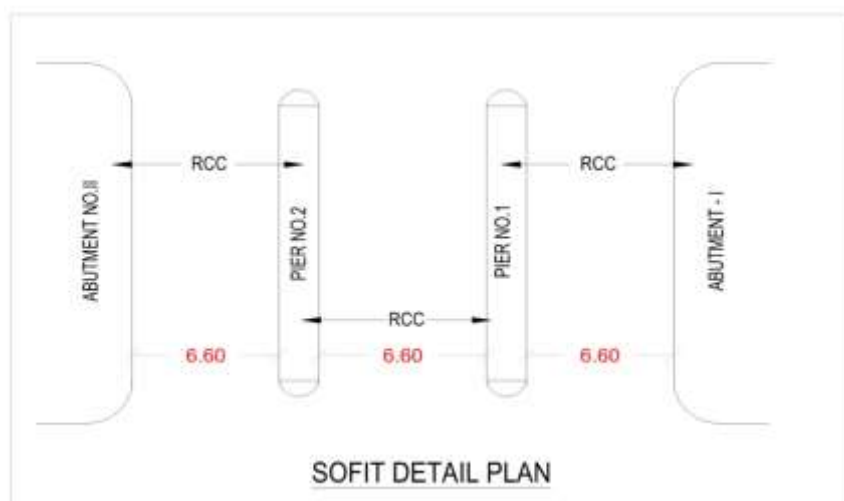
Soffit Detail Plan of Sambhaji Bridge
